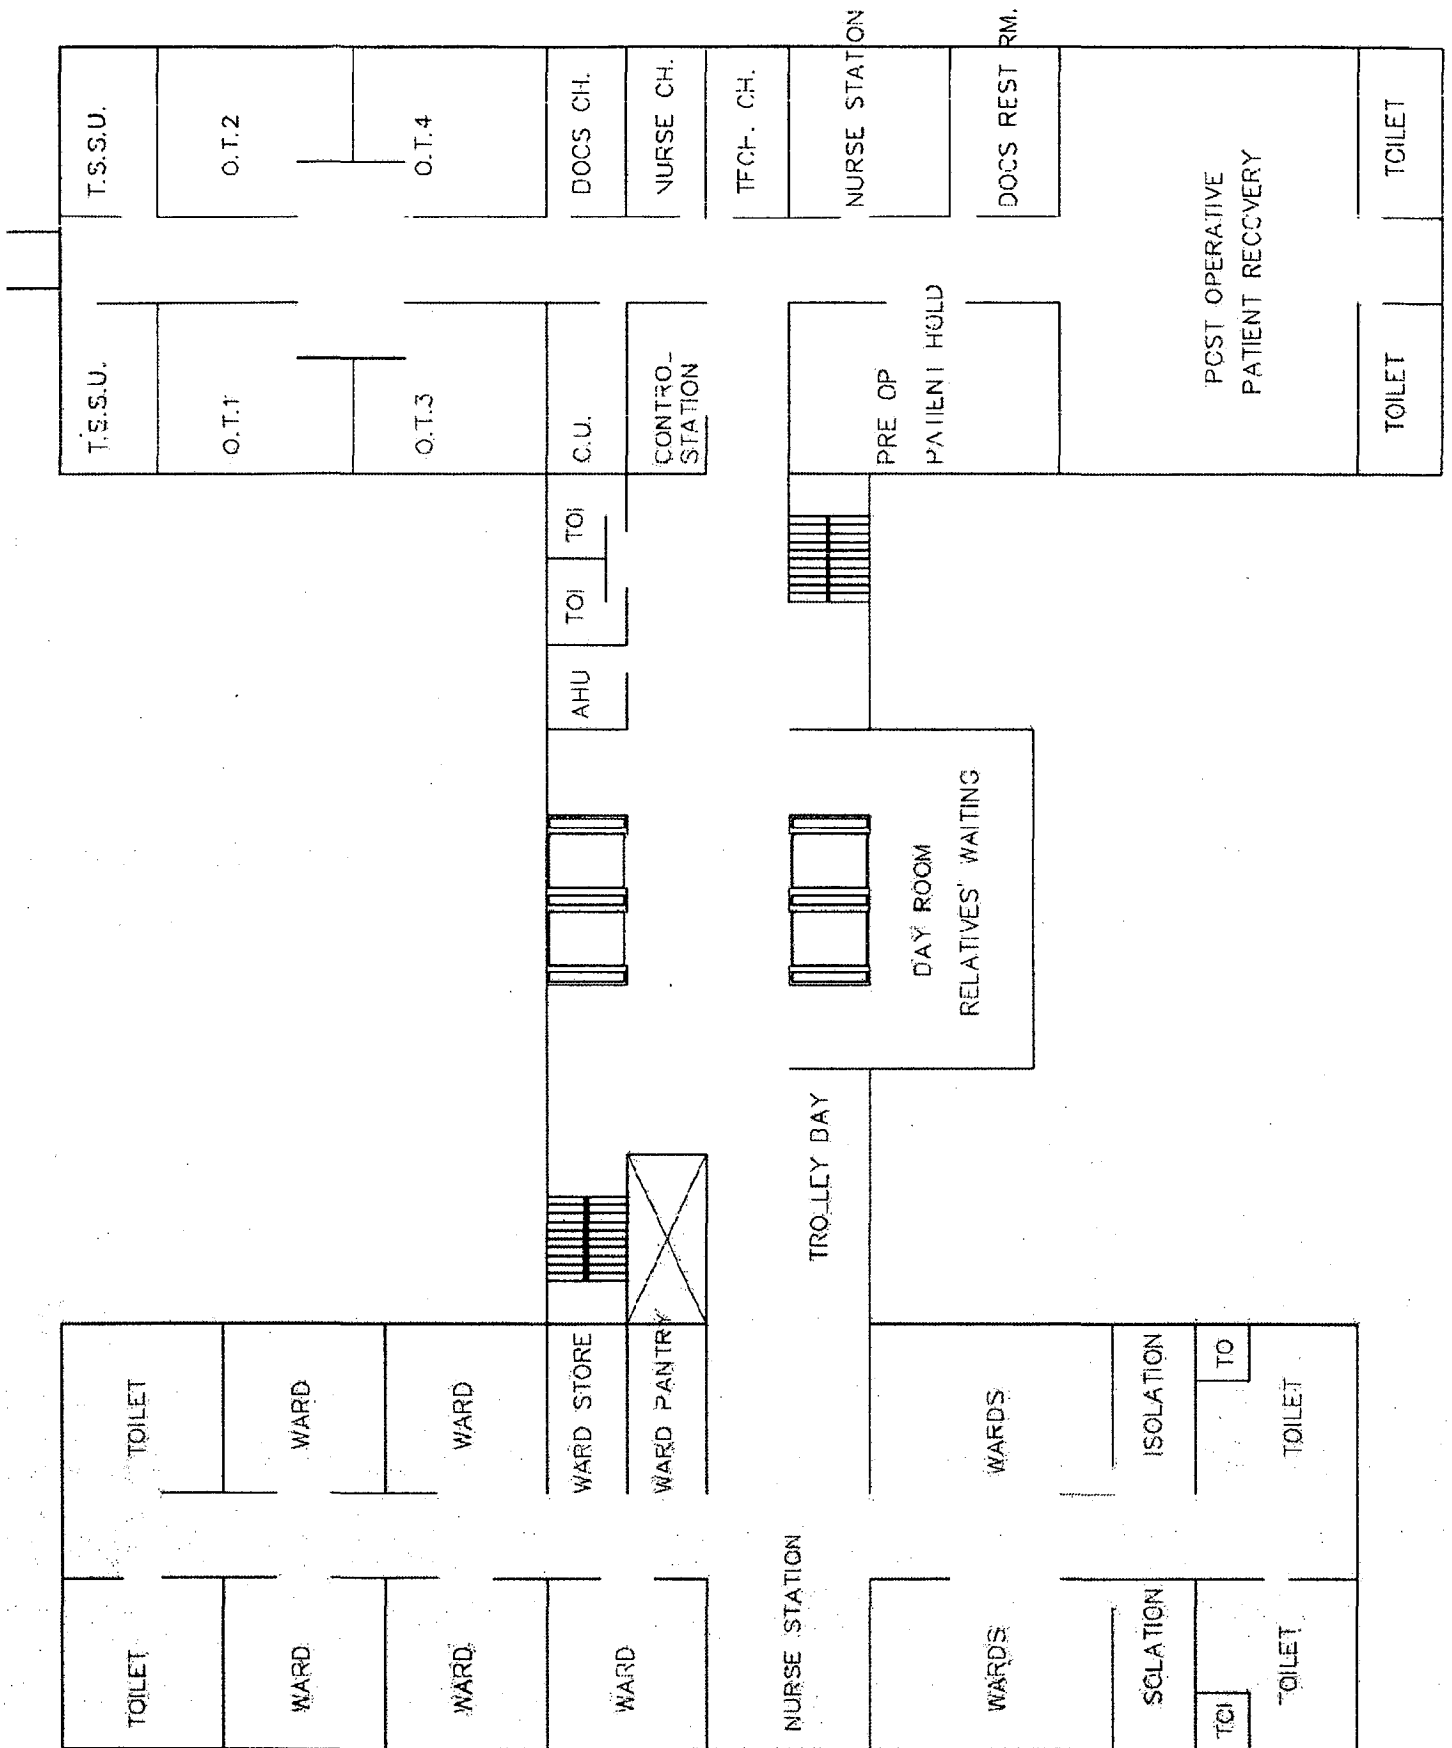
INDIAN HOSPITAL – FOURTH FLOOR PLAN
